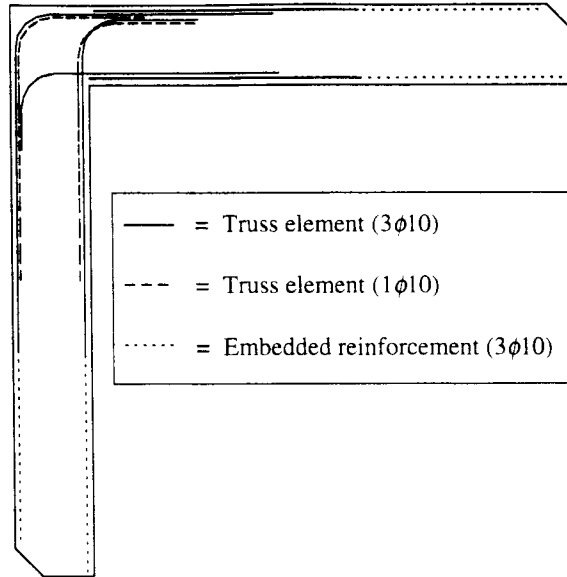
Modelling of the reinforcement bars in the frame corner with conventional reinforcement detailing.
